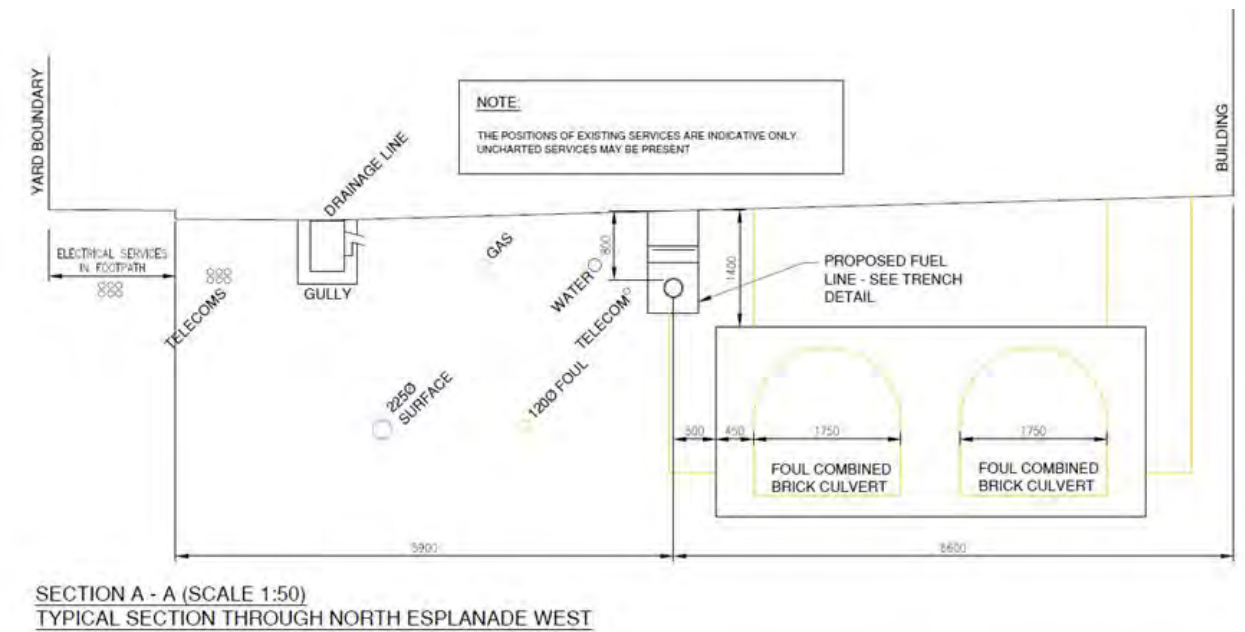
15 Two large sewers shown to run along North Esplanade East.
